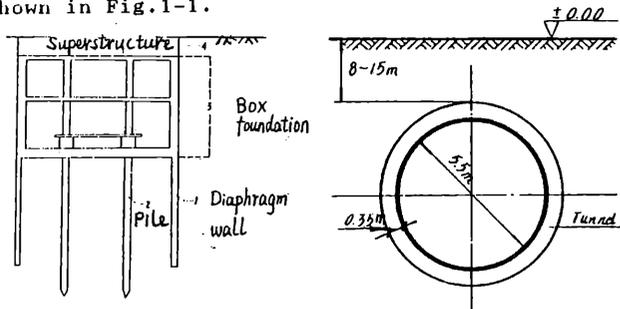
Cross-section of Xingzha Road Station and tunnel
